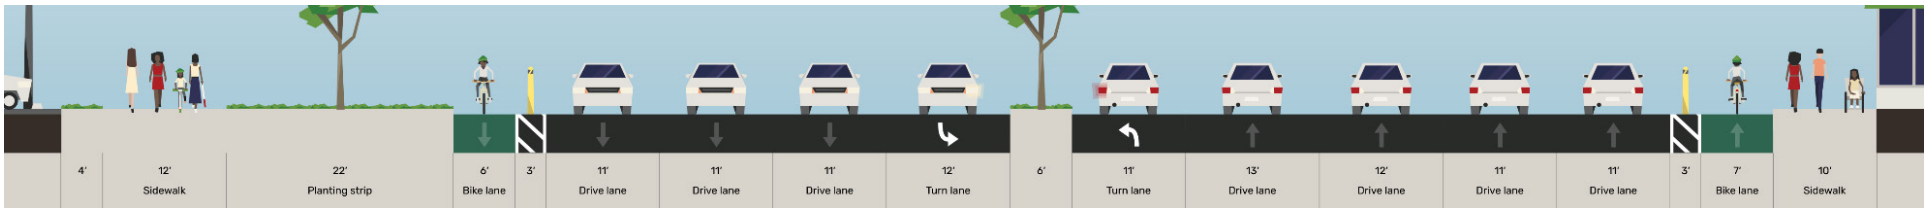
Proposed cross-section: Hawthorne Blvd from W Broadway to El Segundo Blvd
